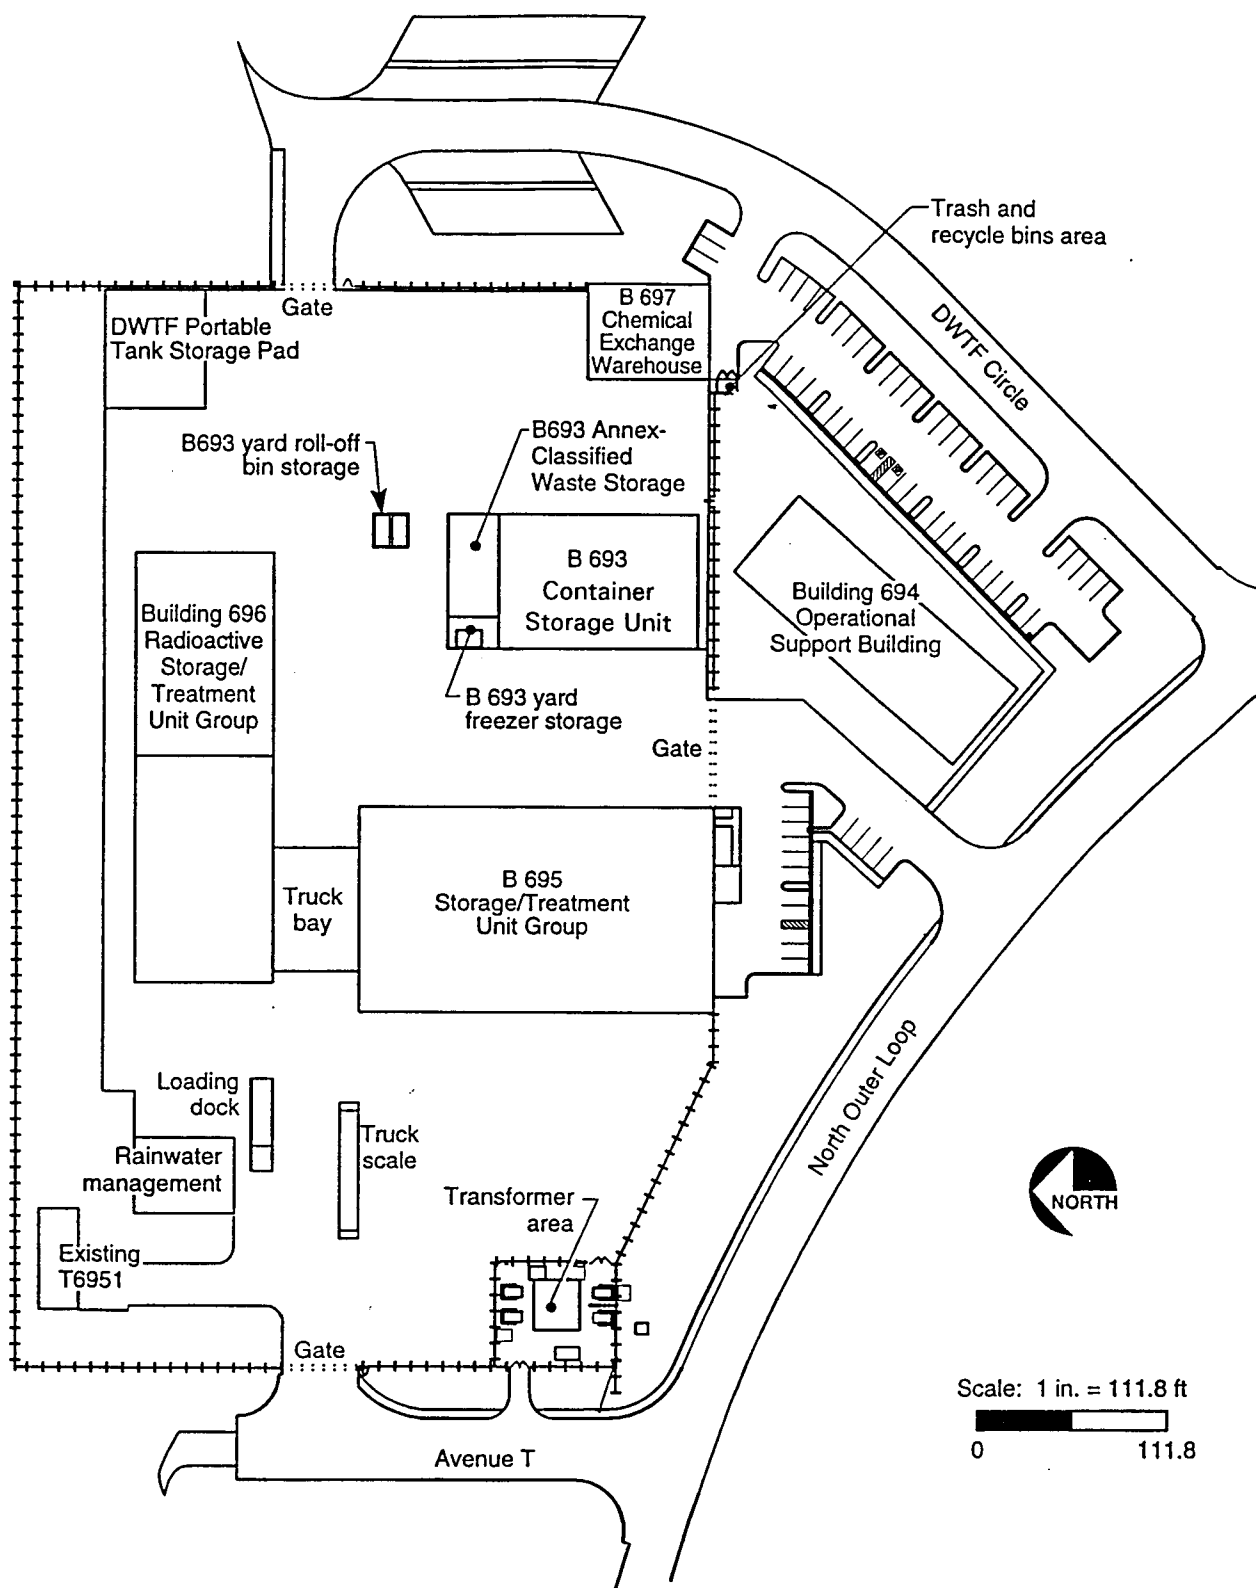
Location of Building 693 Storage/Treatment Unit Group within DTWF Complex
